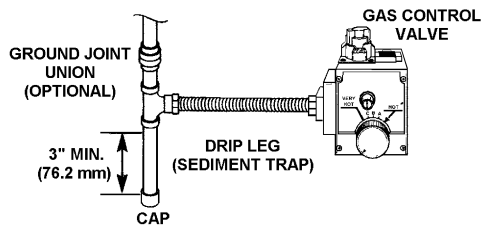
GAS PIPING WITH FLEXIBLE CONNECTOR.
